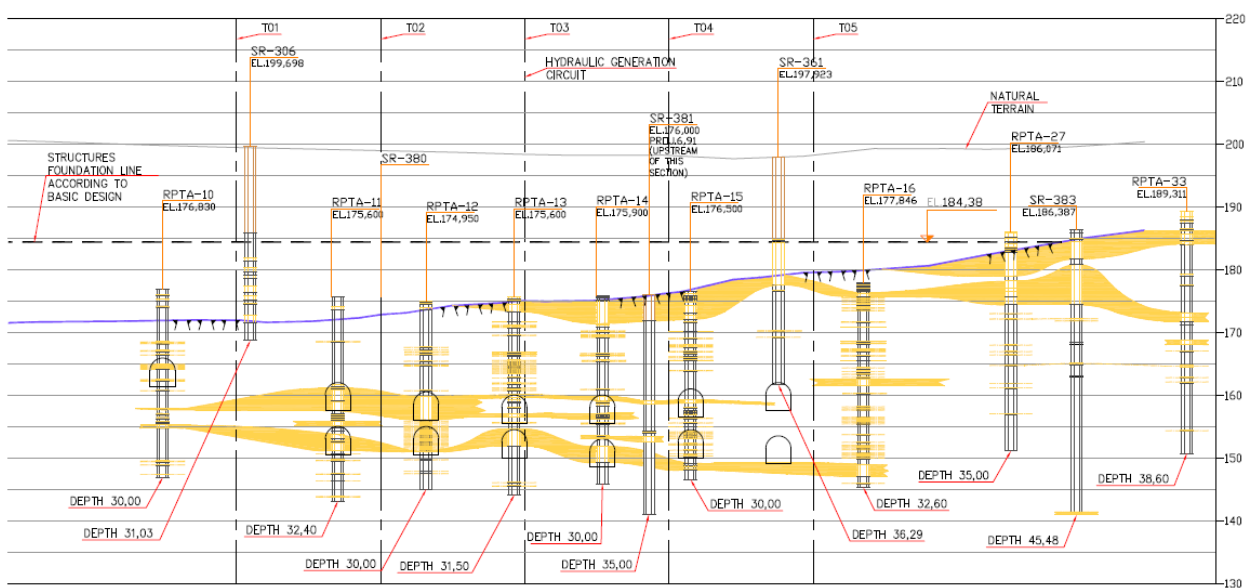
Updated discontinuity pattern at water intake structure foundation – Longitudinal section
